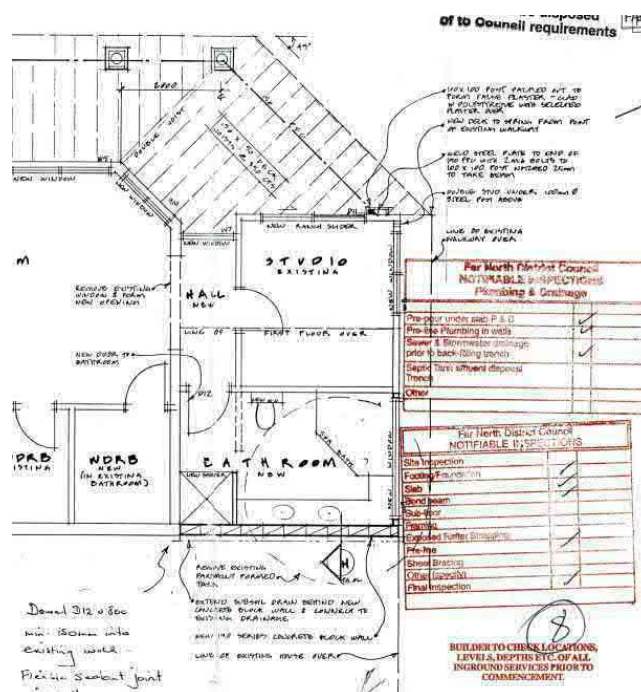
2001 plan of extensions/renovations. The slip and proposed retaining walls are immediately to the right of the building footprint. The Studio appears to be the 1983 extension floor slab. The bathroom is of new construction, including extending the concrete block retaining wall. The new bathroom floor slab, directly above the slope, is shown as having a 200 wide footing extending 400 into solid bearing elsewhere in the drawing set.
